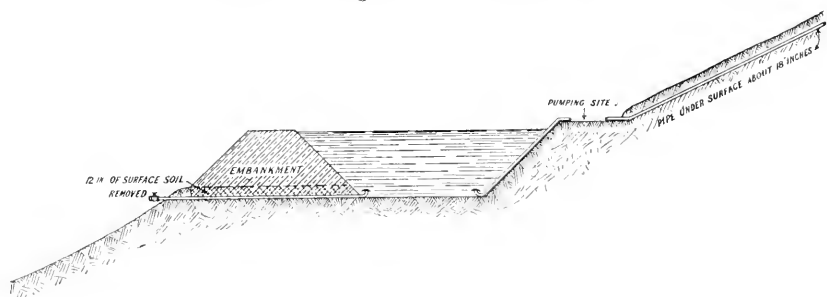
Section of dam showing embankment and portion of outlet pipe, &c.
